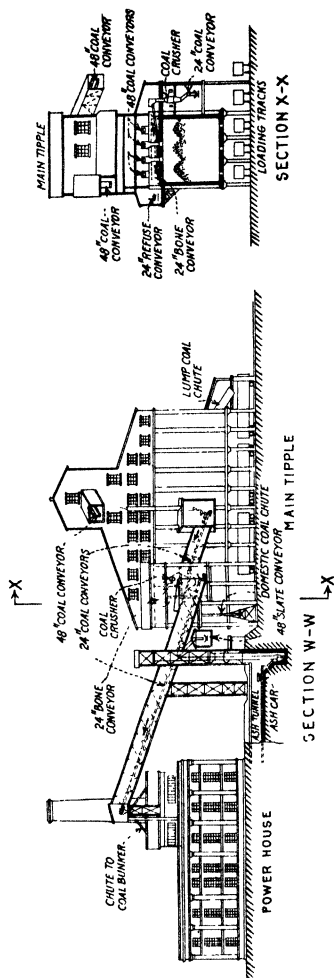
SECTIONAL VIEWS OF TIPPY.
